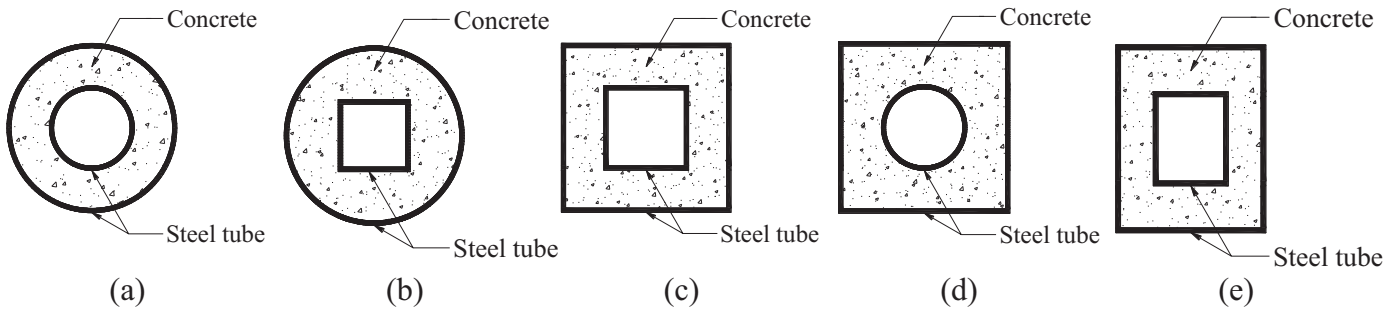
Concrete-filled double-skin steel tubes previously studied.
